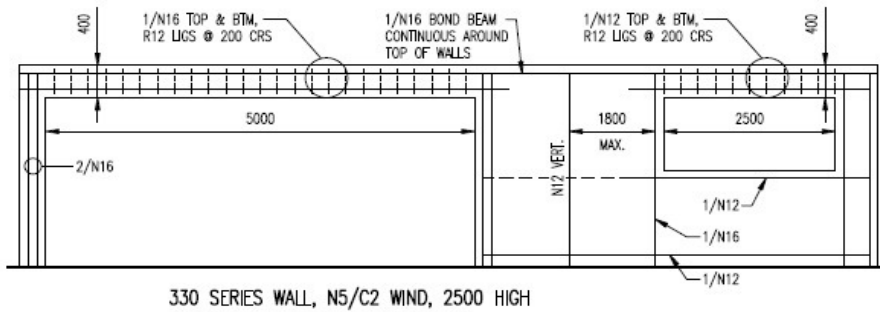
2500 High Wall, N5/C2 Wind Rating, 330 Series ECO-Block (Max. roof load width: 6.0m)
